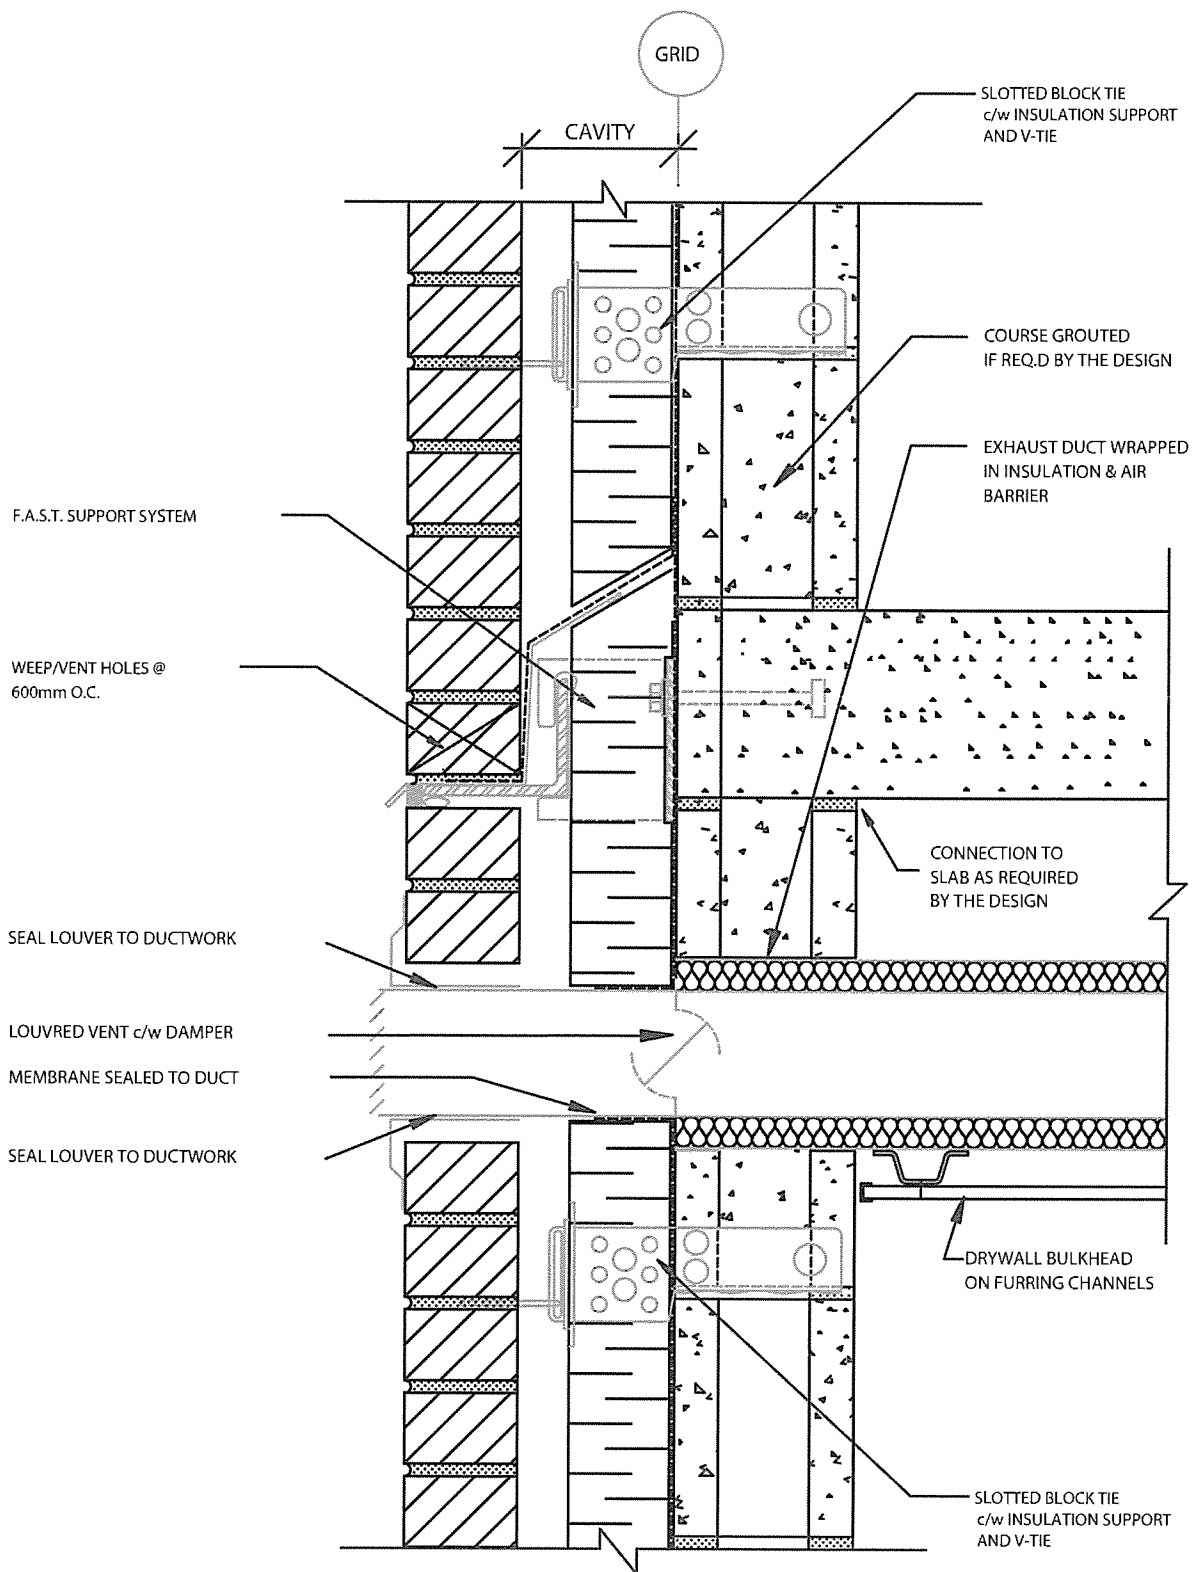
BRICK VENEER/CONCRETE BLOCK-EXHAUST VENT DETAIL
